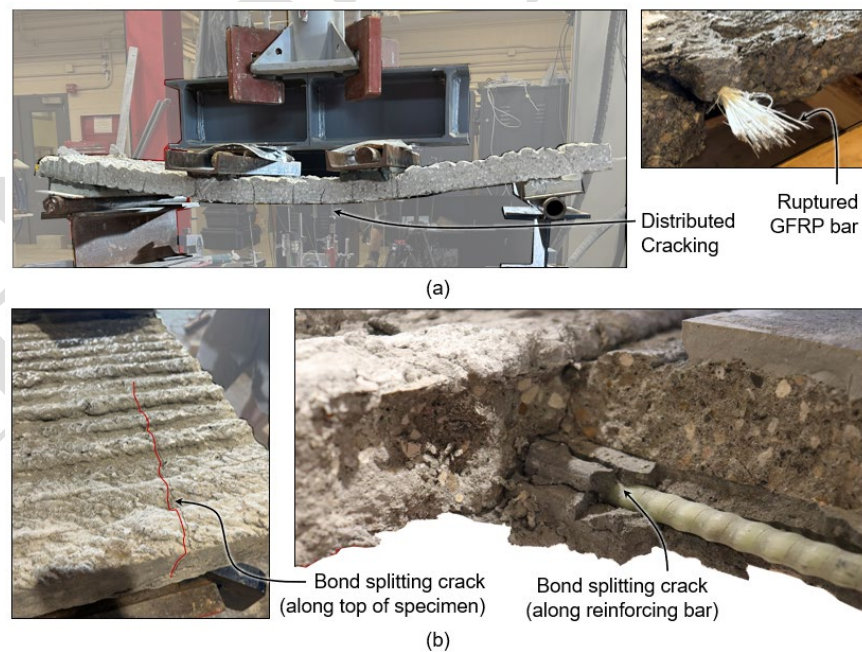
Observed failure modes: (a) rupture of GFRP reinforcement (b) bond splitting failure.
